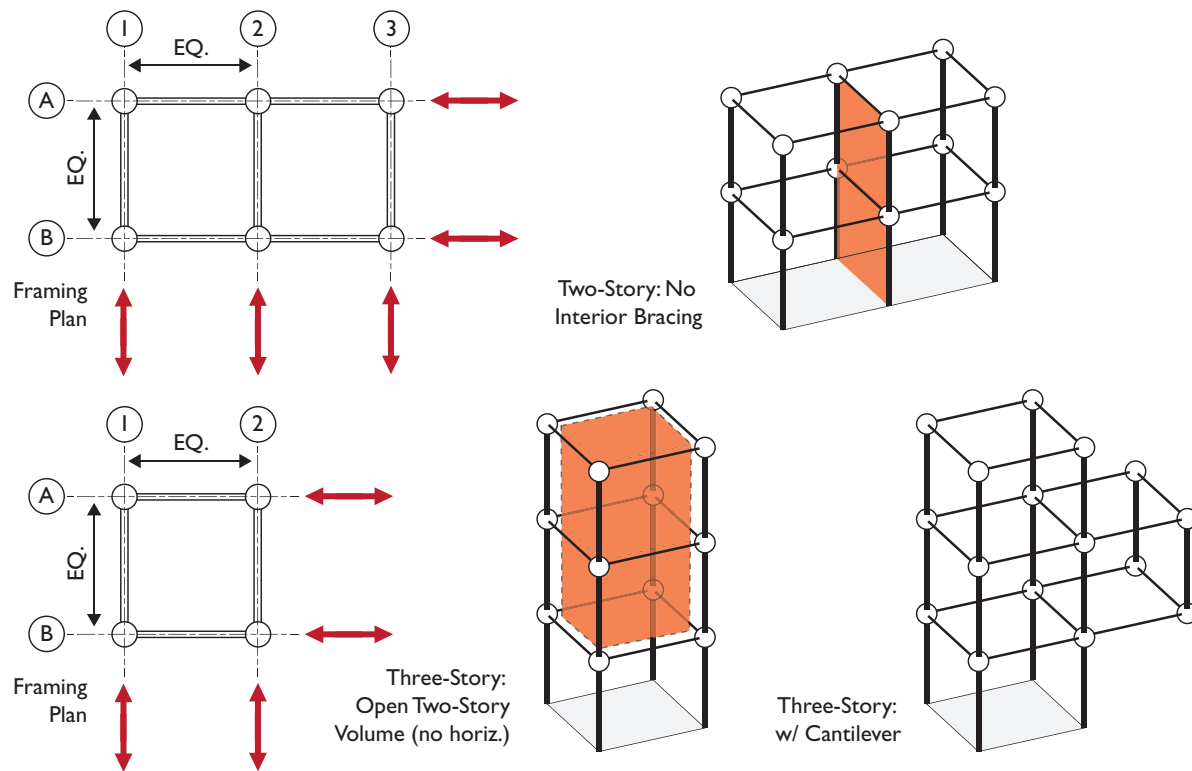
and 6.0.17b Two-story bracing exercise. Avoid soft-story collapse by ensuring a continuity of force flow through bracing from the top to the bottom. Consider the spatial consequences of using bracing, fixed connections, or walls to do so. 6.0.17b: Mola structural kit model demonstration of multi-story bracing options
